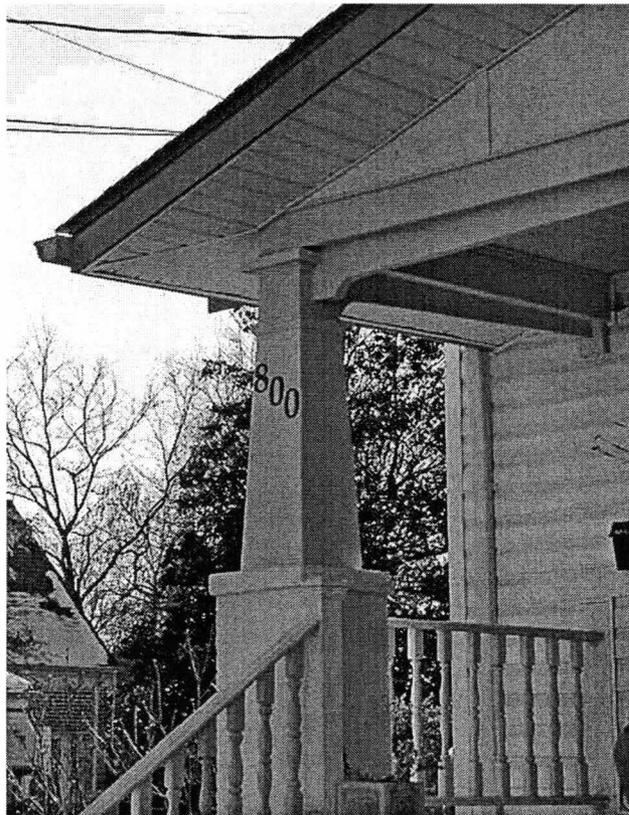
Detail of original front porch support at 800 North Highland Street, with brick pier and tapered wood column; photograph by author, February 2003.
